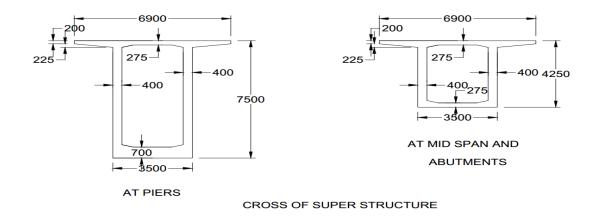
Details of box girder section of Ringhal Khad bridge
